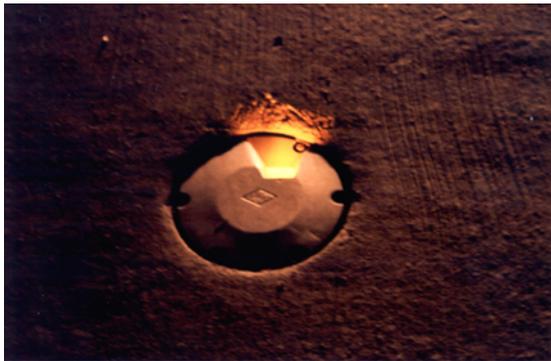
In-Pavement L-852G Runway Guard Light With Reflection on Pavement
